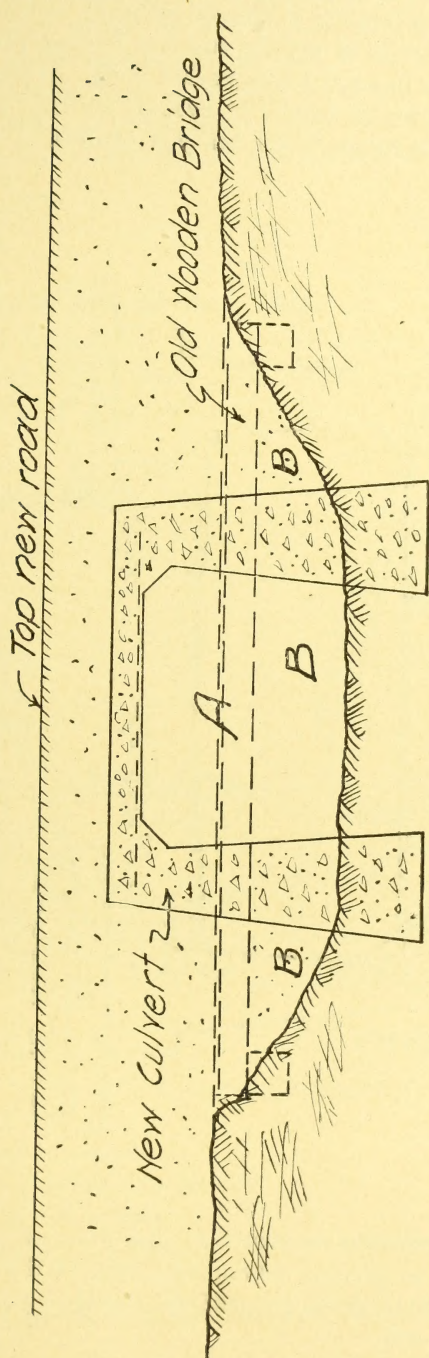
In replacing an old culvert the area of waterway of the new culvert should be approximately the same as that under the old culvert. (Area A should equal area B, B, B.)
